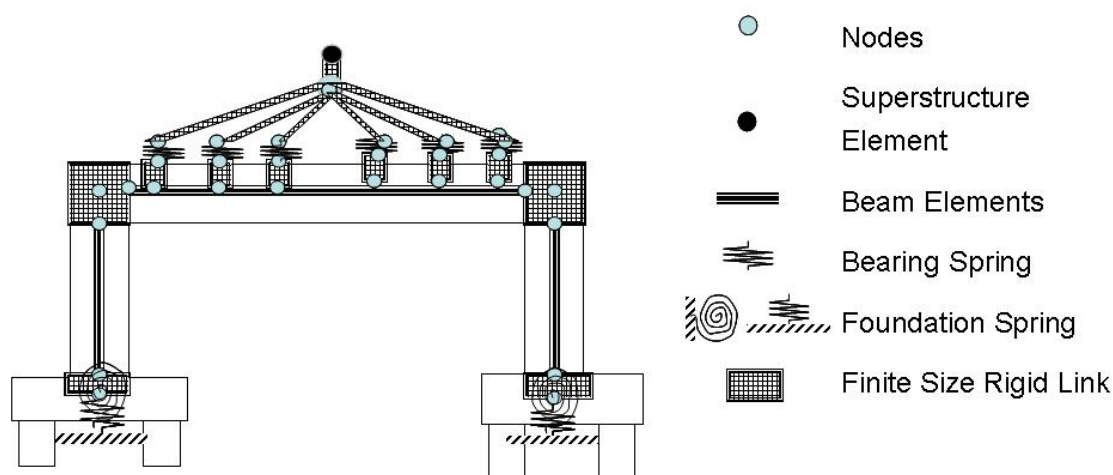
a - Element Idealization and Geometric Offsets
